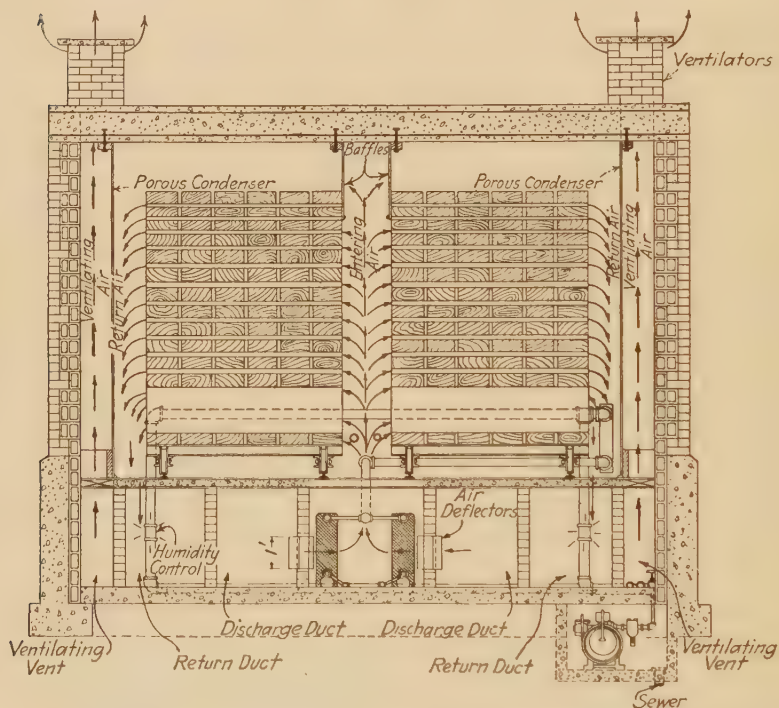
Transverse section of curtain kiln. (Courtesy, Culler Desk Co.)
